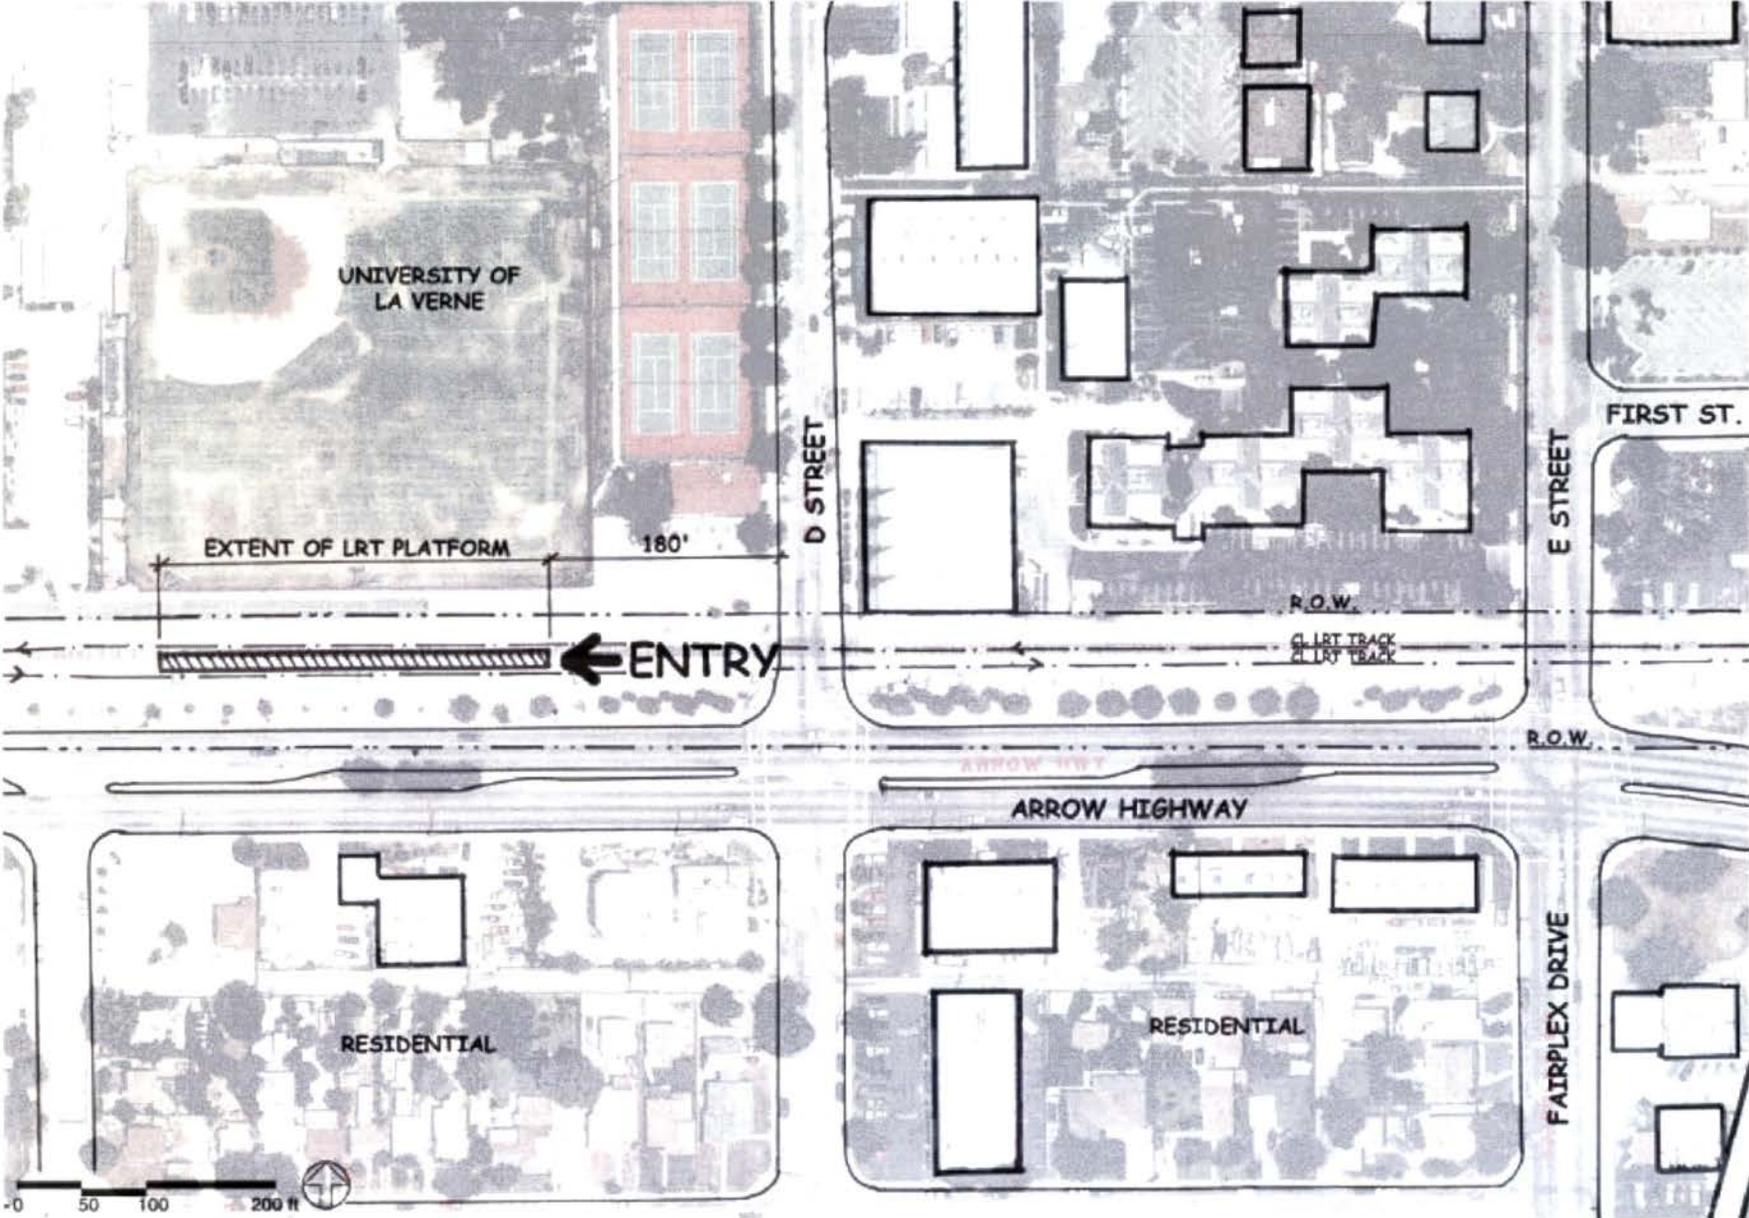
Site Plan: City of La Verne D Street Station, Option C
